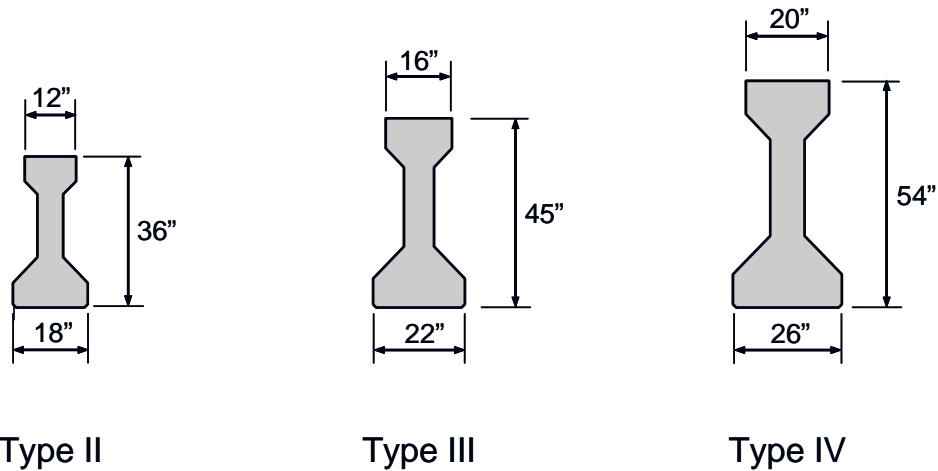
Standard AASHTO I-Girder Sections for Prestressed Bridges
